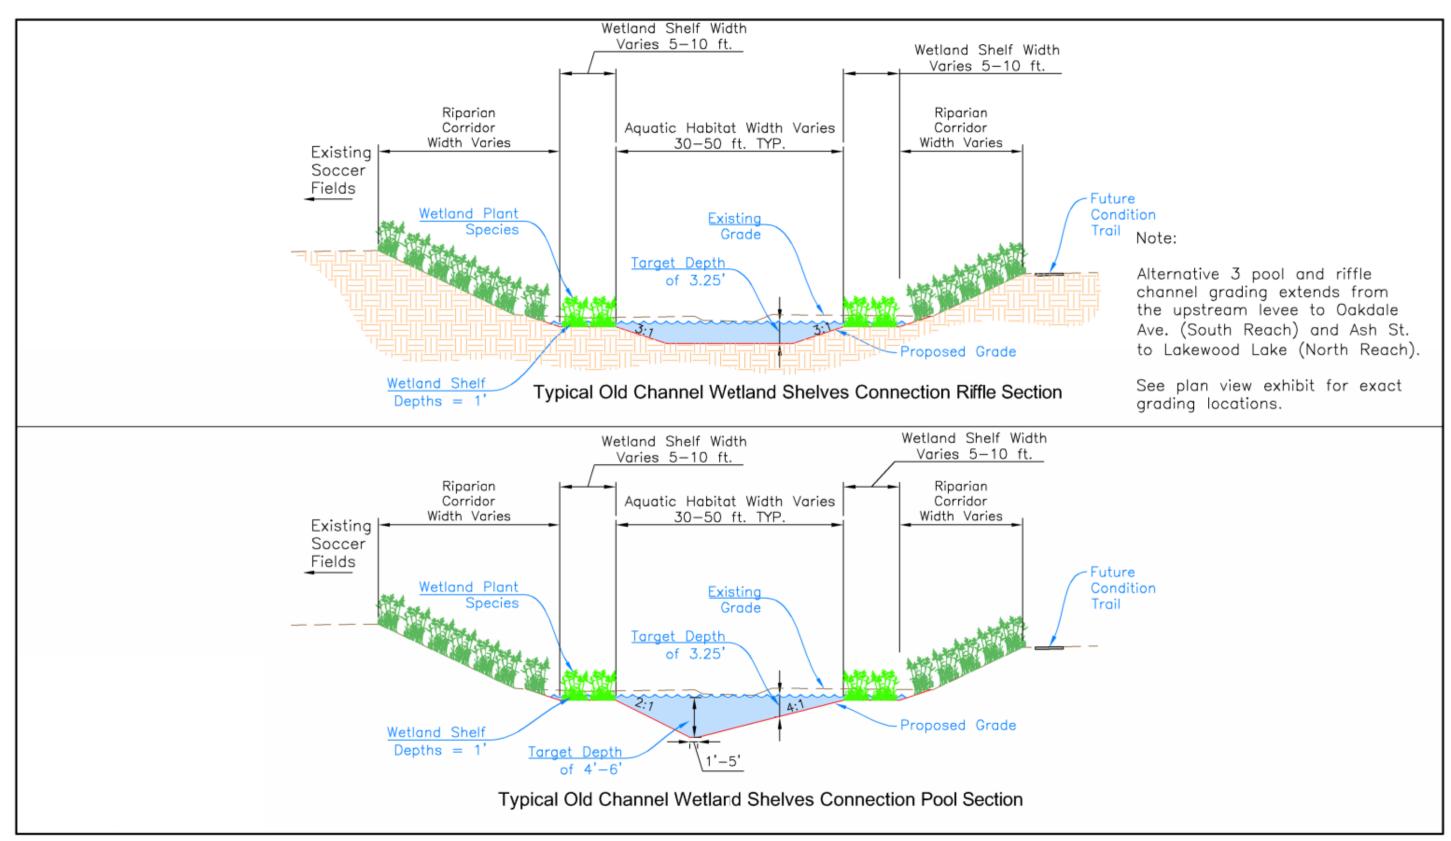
Alternative A3 Non-Uniform Channel Typical Wetland Shelve Sections
